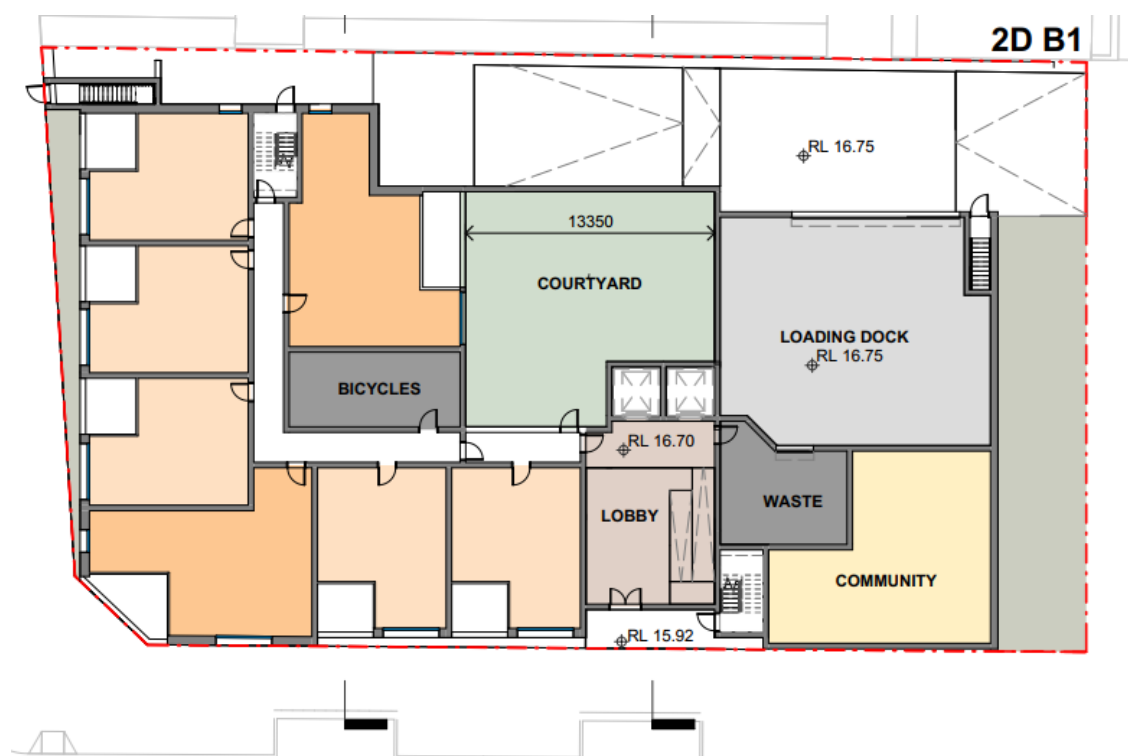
Building 2D Reference Scheme Ground Floor Plan
